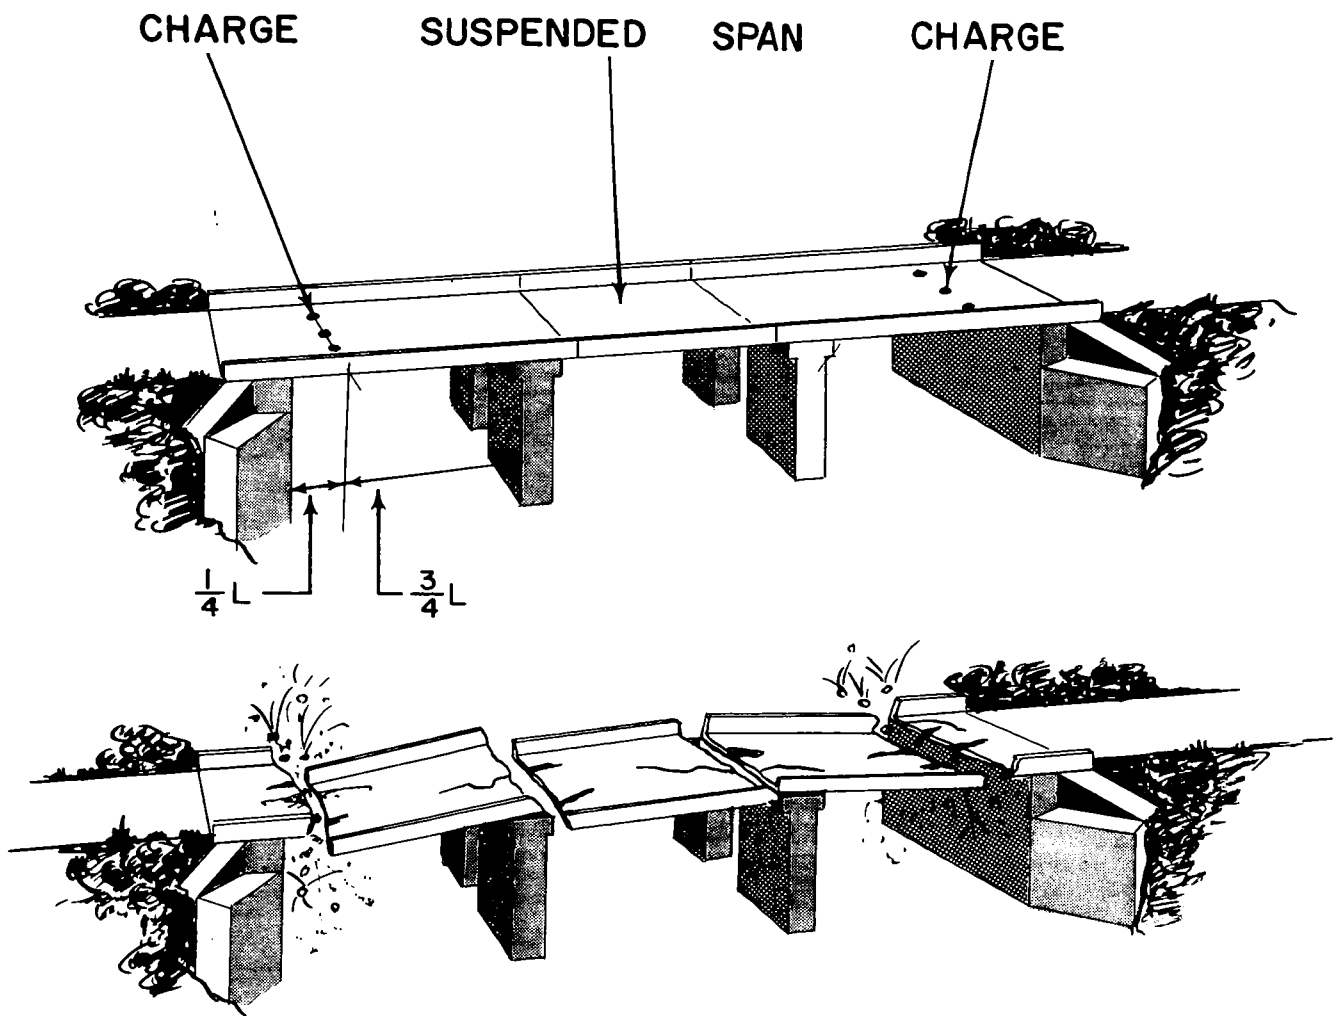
Demolition of concrete cantilever bridge with suspended span.
